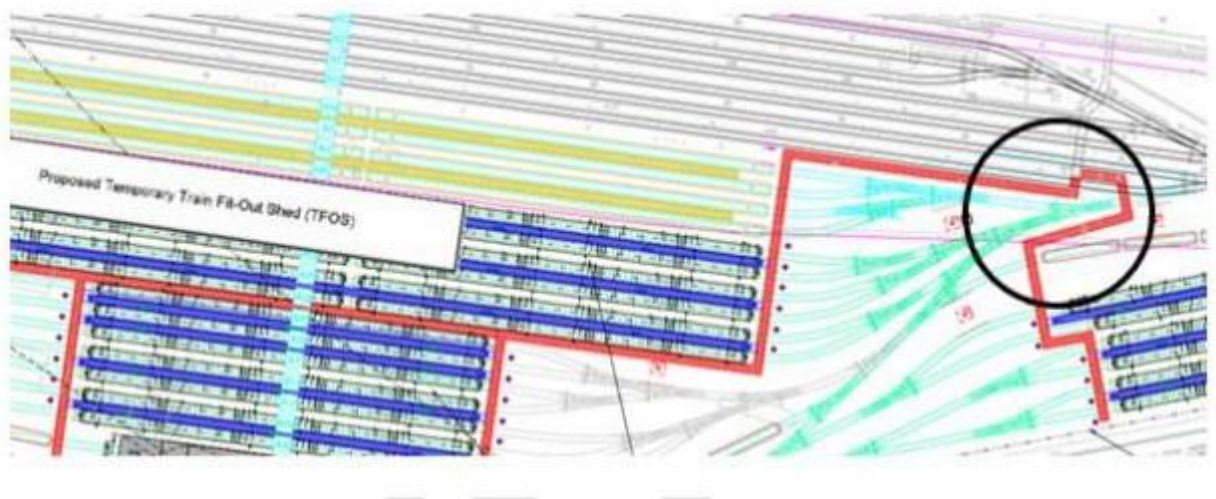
Beckton layout indicating track connection to Southern Sidings
